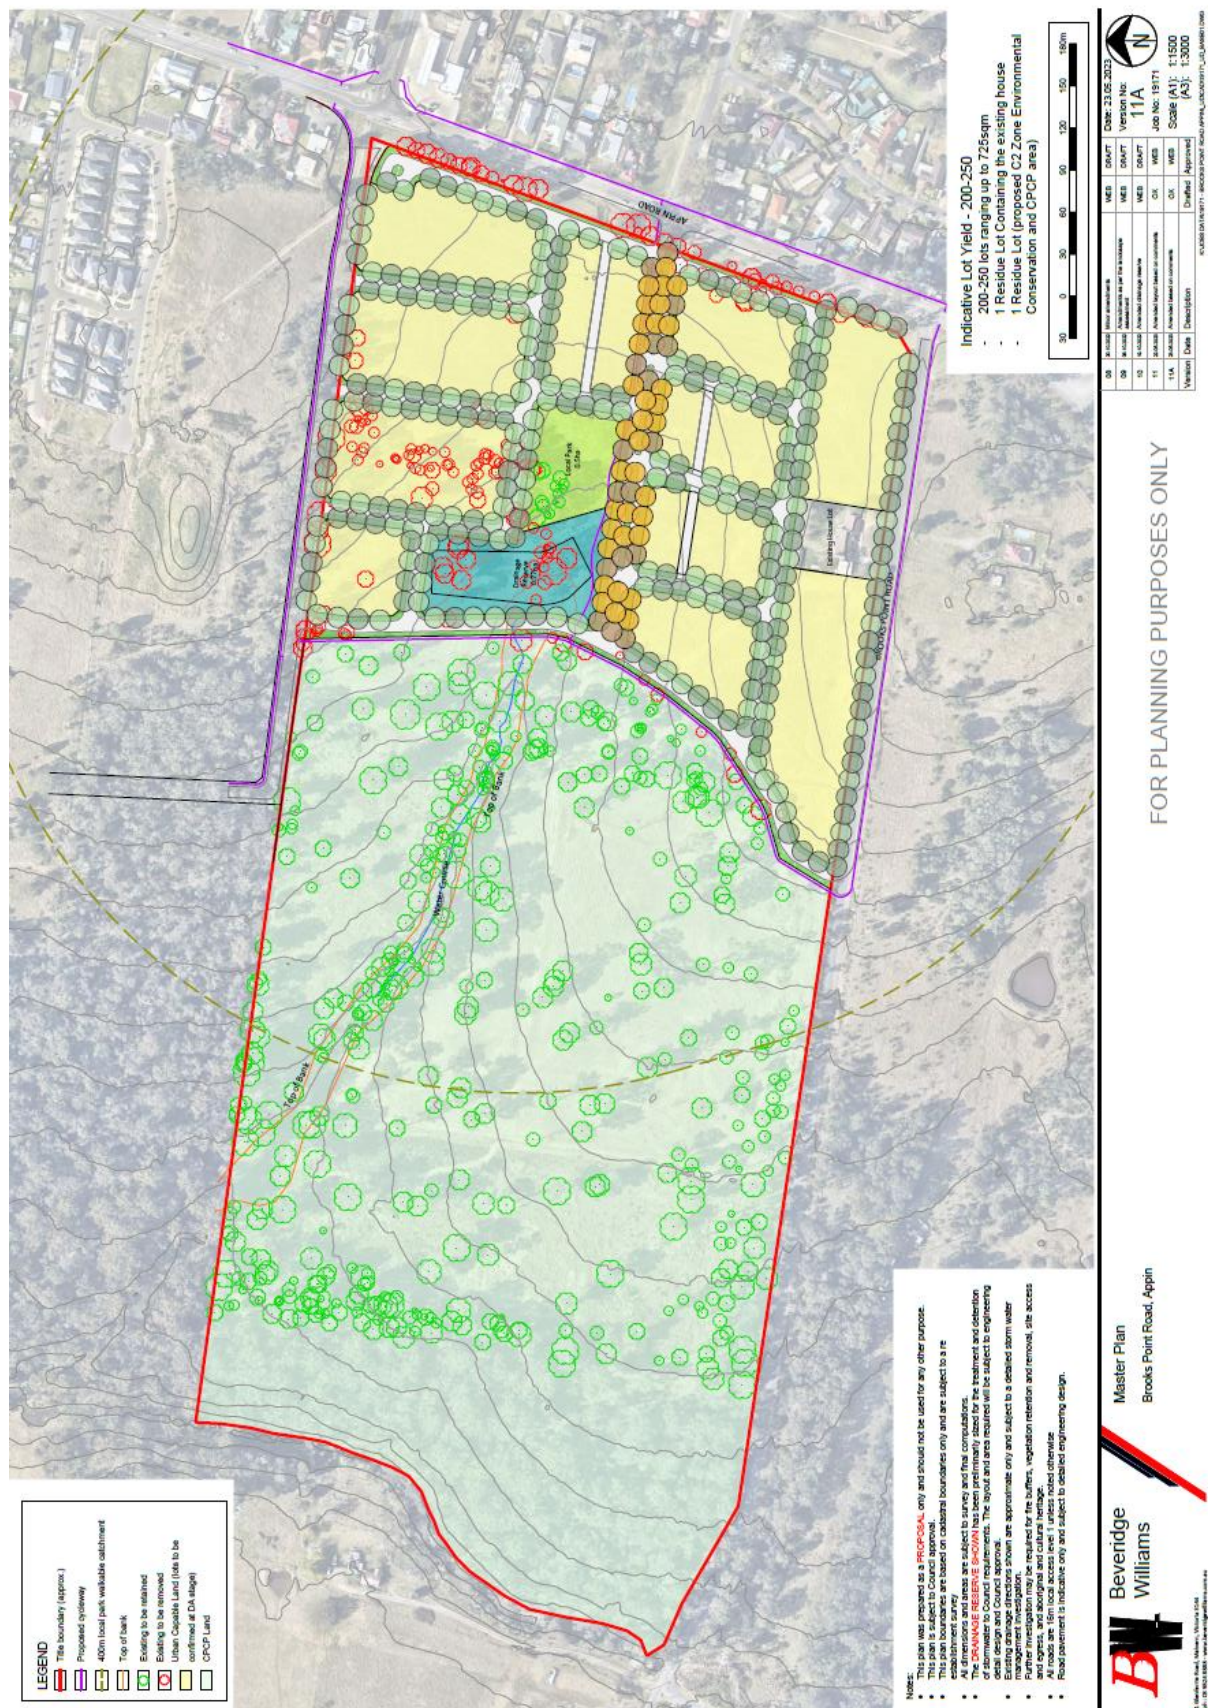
Extract of Master Plan prepared by Beveridge Williams
